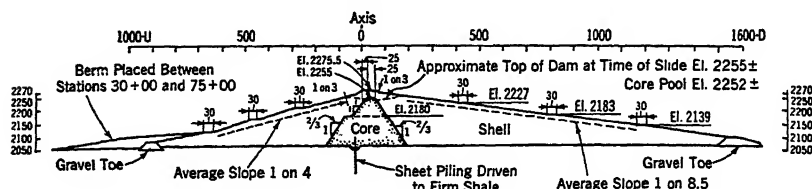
Fort Peck Dam as originally constructed to elevation 2, 255 ±.
